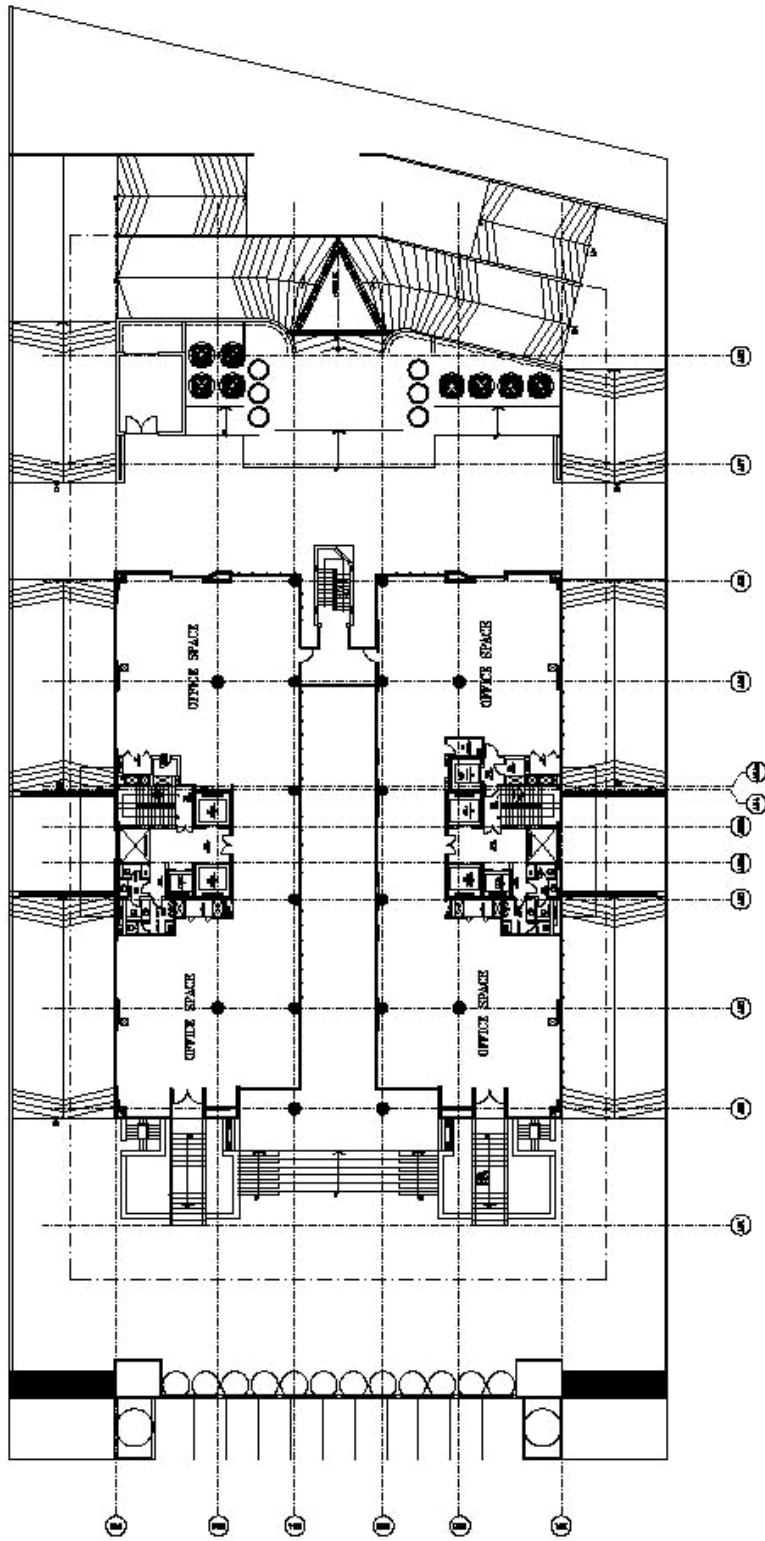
Birla Corporate Office, New Delhi: Lower Ground Floor Plan
